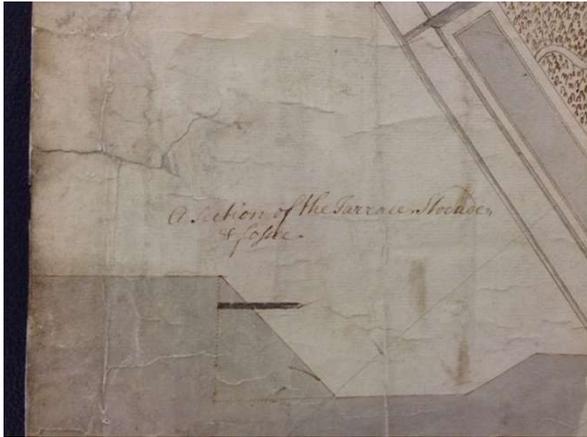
Detail from the plan for Hackwood (MSGD a3 fo.34).
